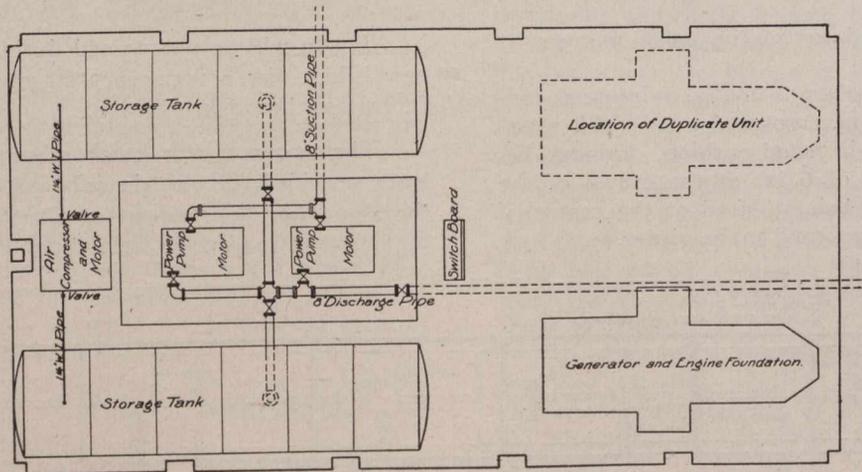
Plan Showing Arrangement of Machinery in Power House.
